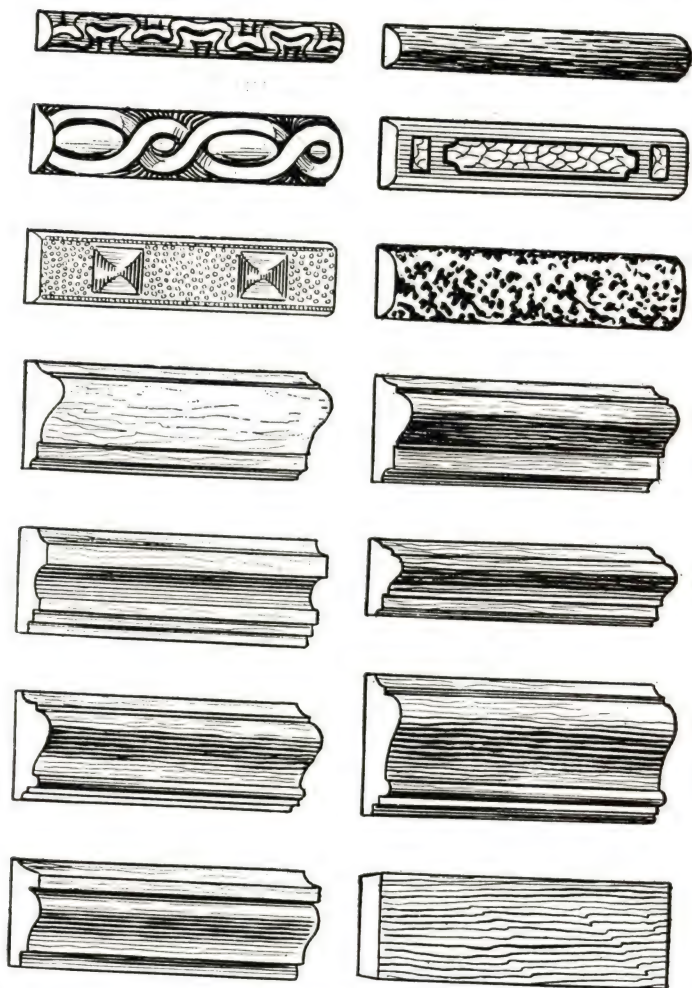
The Various Styles of Mouldings Used for Constructing Wall Panels.
